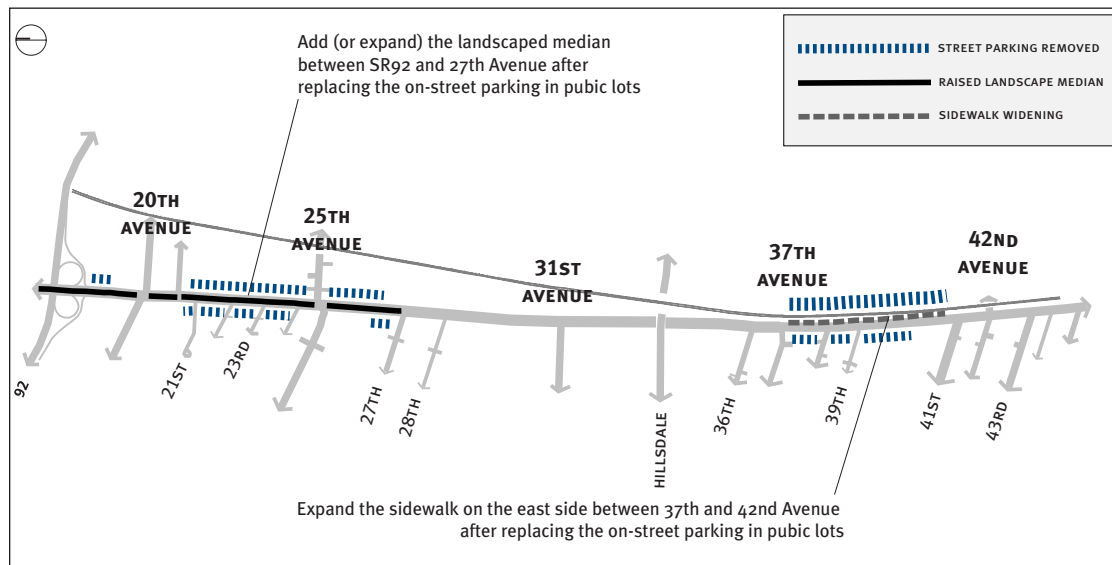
Phase 2 improvements include the extension of the landscape medians in the northern portion and improvements and widening of the sidewalks in the southern portion, both requiring the relocation of on-street parking.
